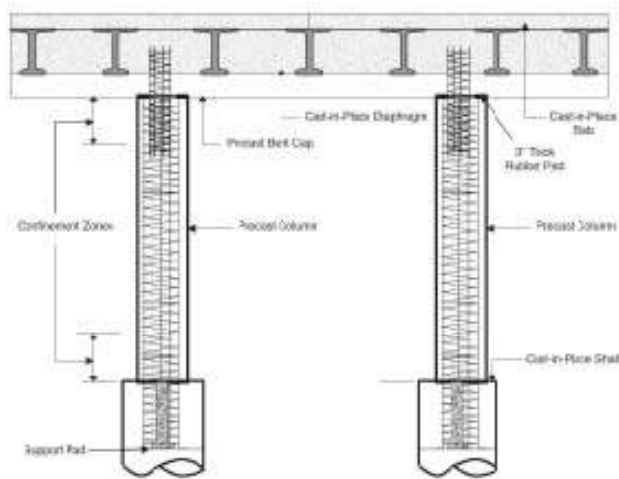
Trestle Type Prefabricated Concrete Columns [36]
